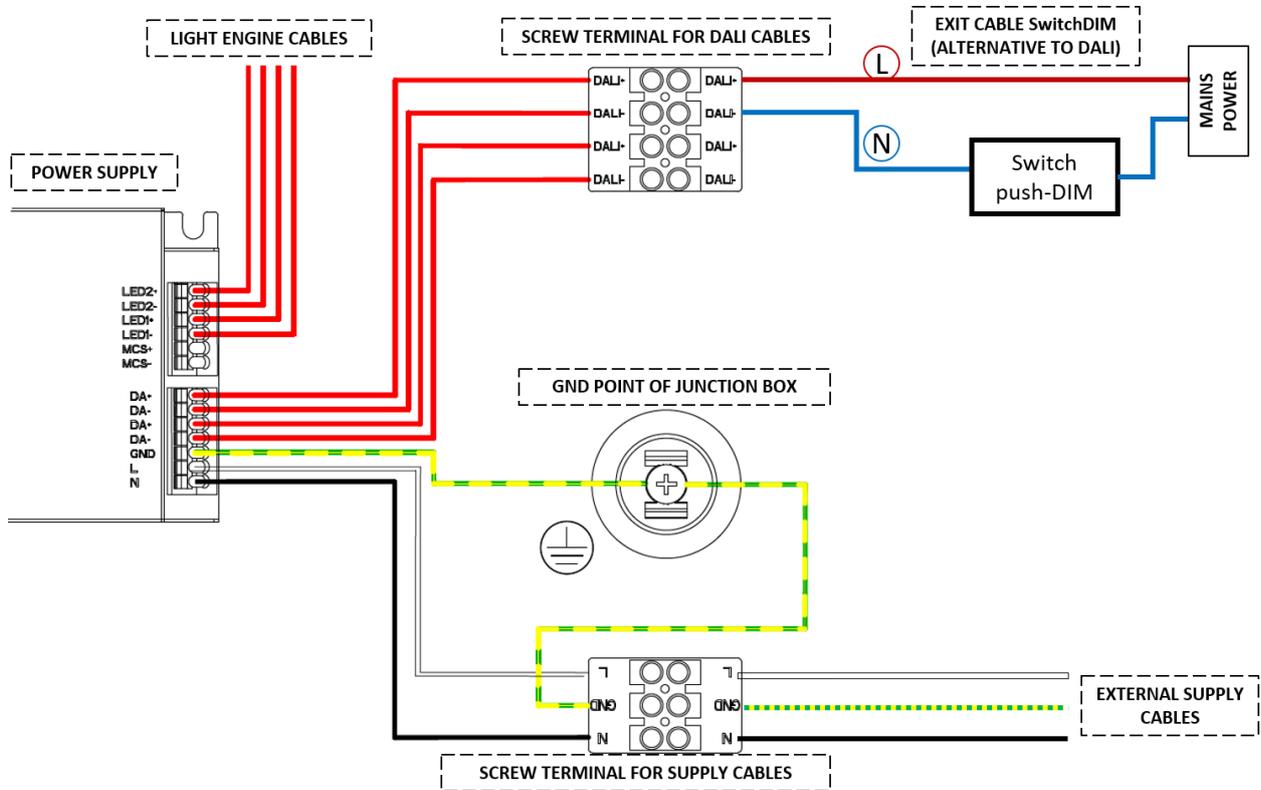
Electrical diagram for connections with the external SwitchDIM cabling
